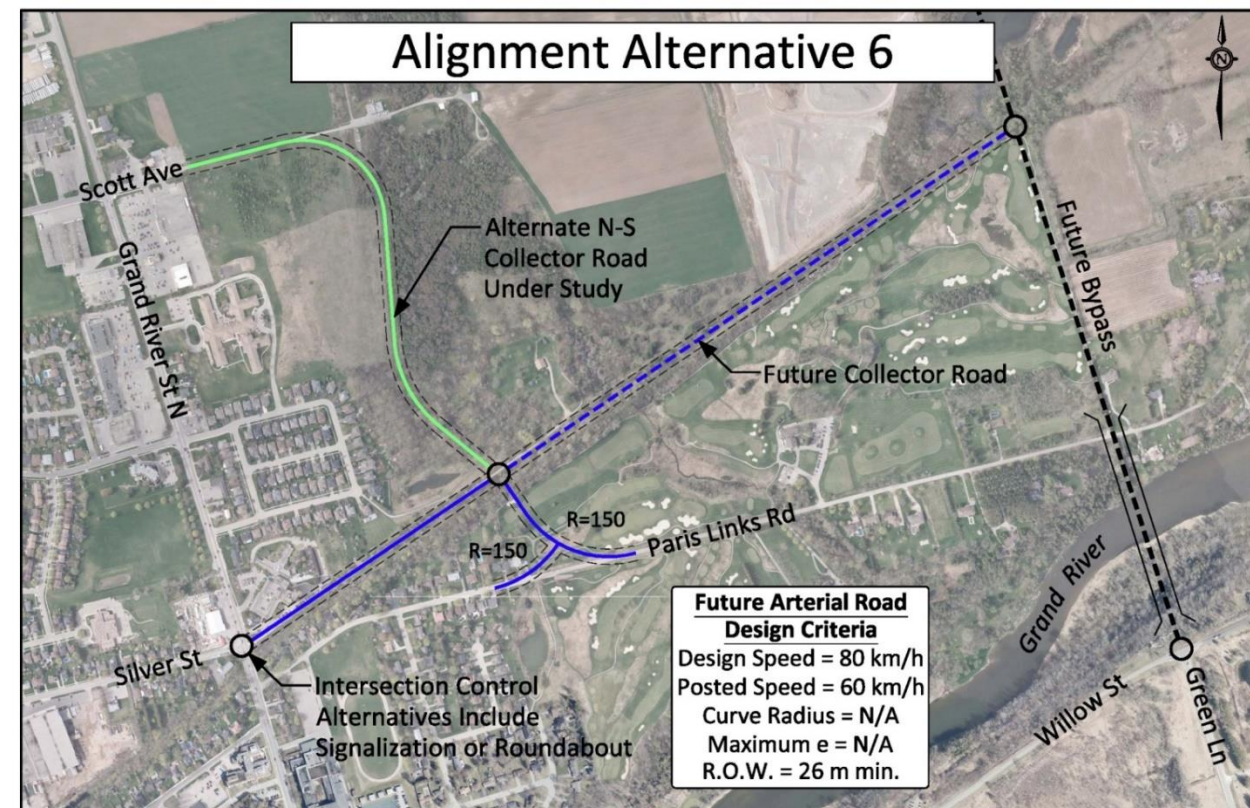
Alternative C - Inclusion of North-South Collector Road to Scott Avenue
